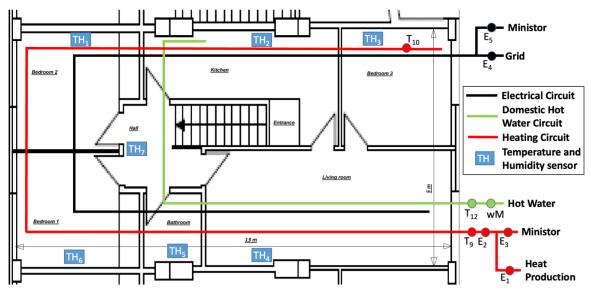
Floor plan of the apartment and its connection to the hydraulic system.
